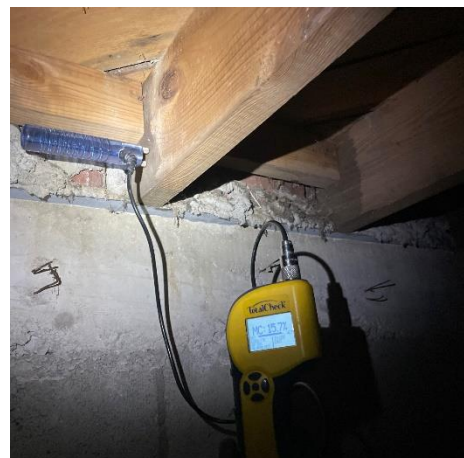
Elevated moisture content measurements at rim joist near building entrance.
